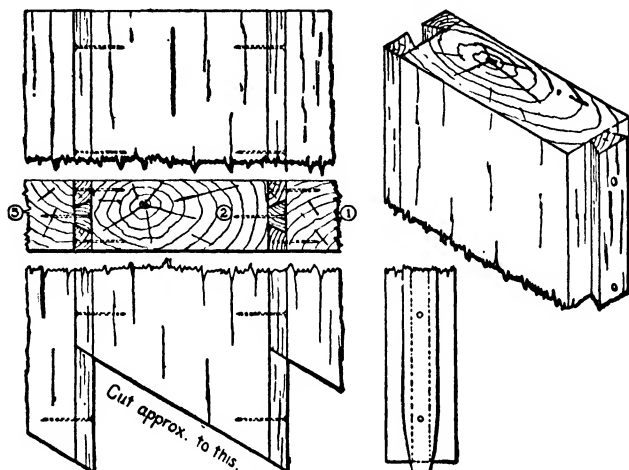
g*.—Details of Timber Sheet Piling with Dovetail Joints.
